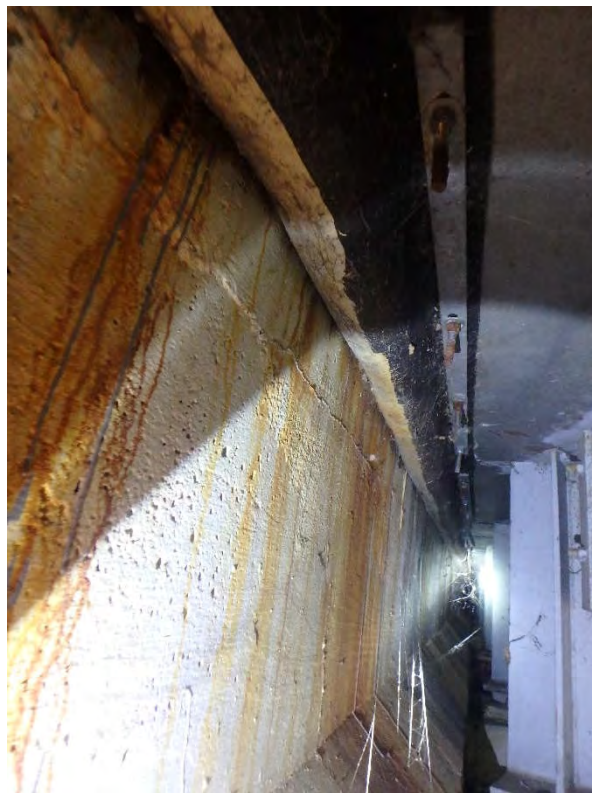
Clara Barton Parkway East (101010/142010) – Looking at abutment connection to bridge deck
